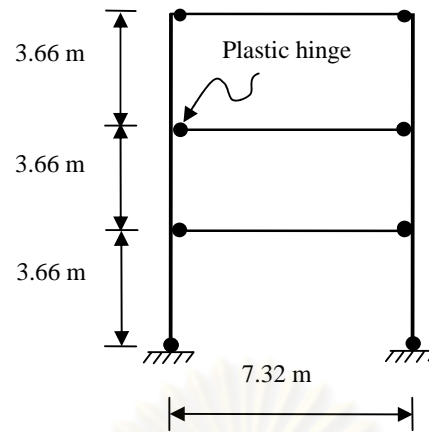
Beam-hinge model of the 3-story one-bay generic frame.
